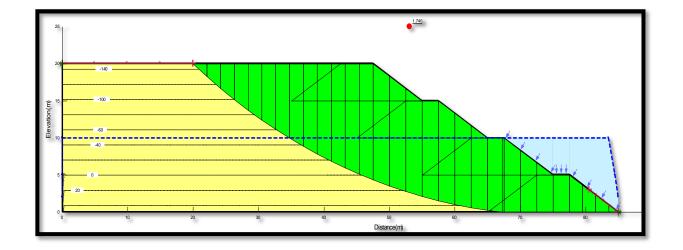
Embankment cross section for 1:1.5 slope at 10 m water level
